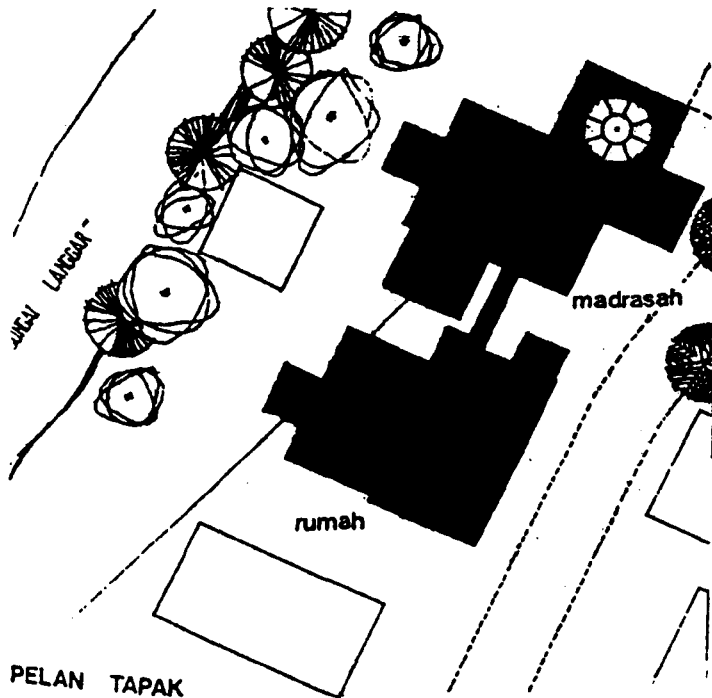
Site plan of 'Madrasah Tok Janggut'.⁶⁶
